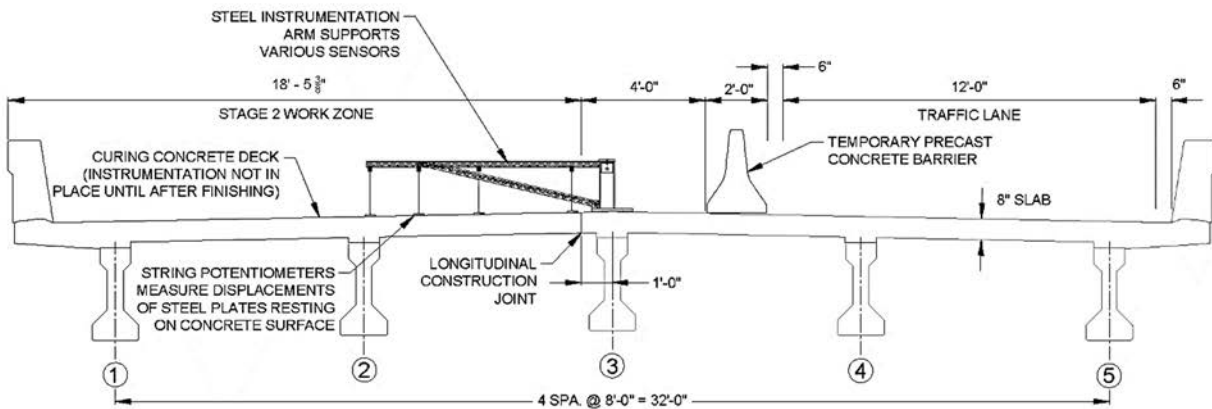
Cross section of bridge B-16-136 during stage 2 construction (looking north)
